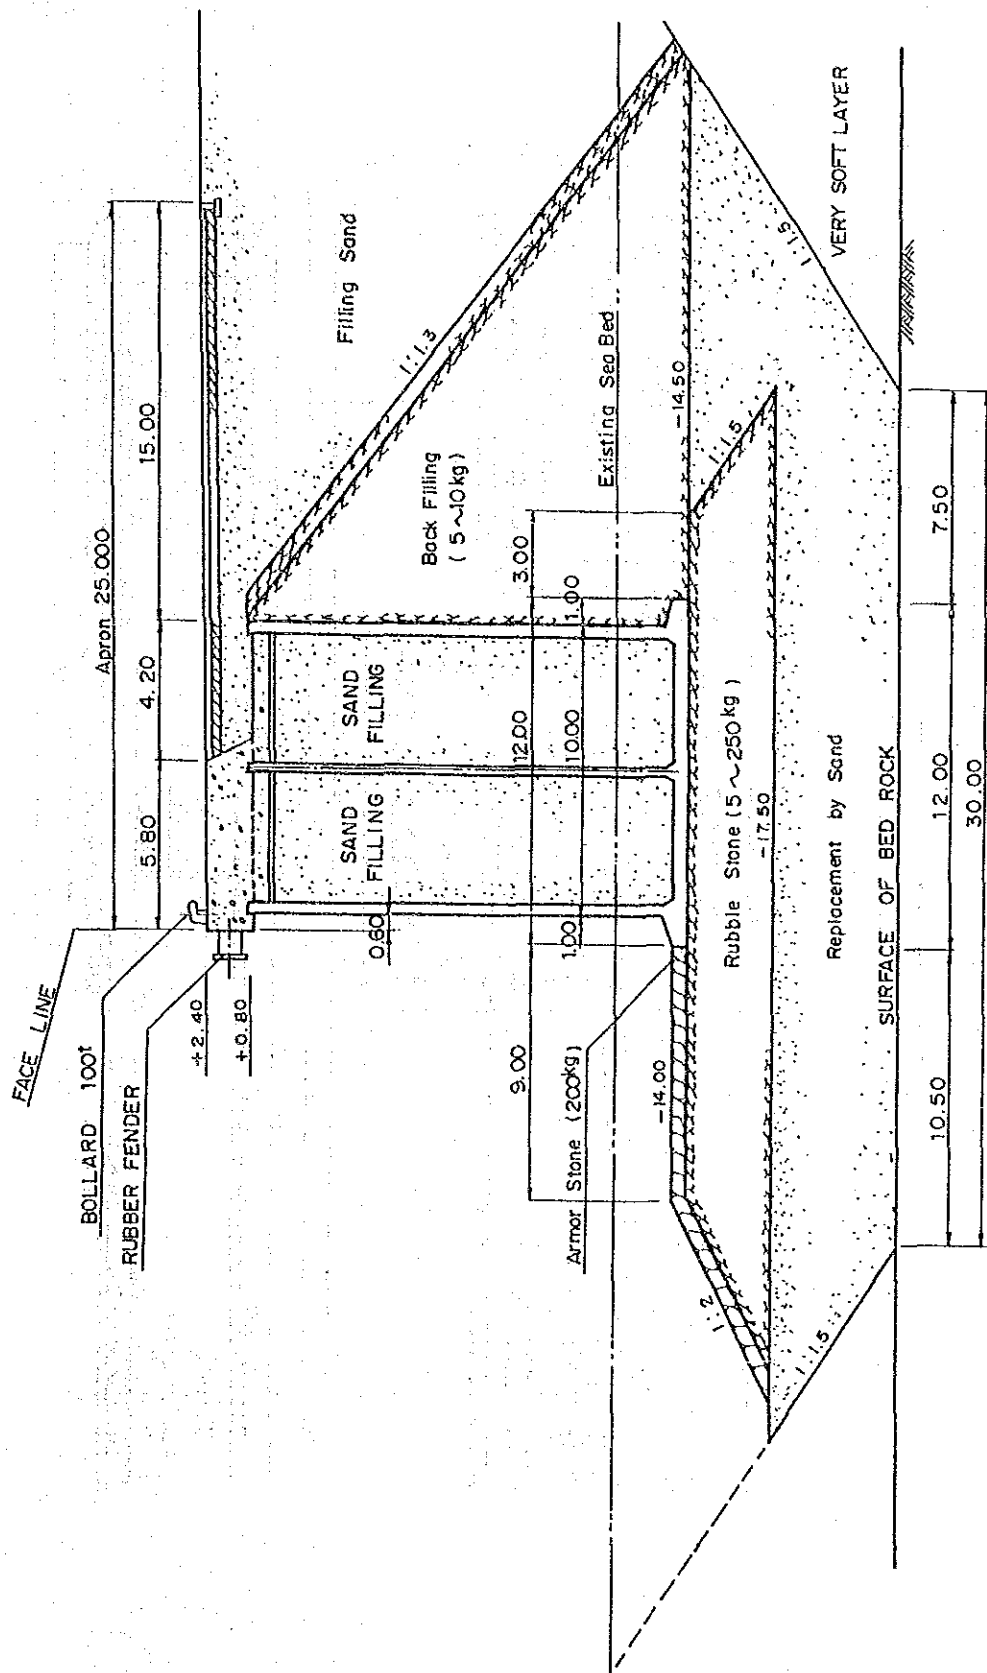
Typical Cross Section of General/Bulk Cargo Berth
